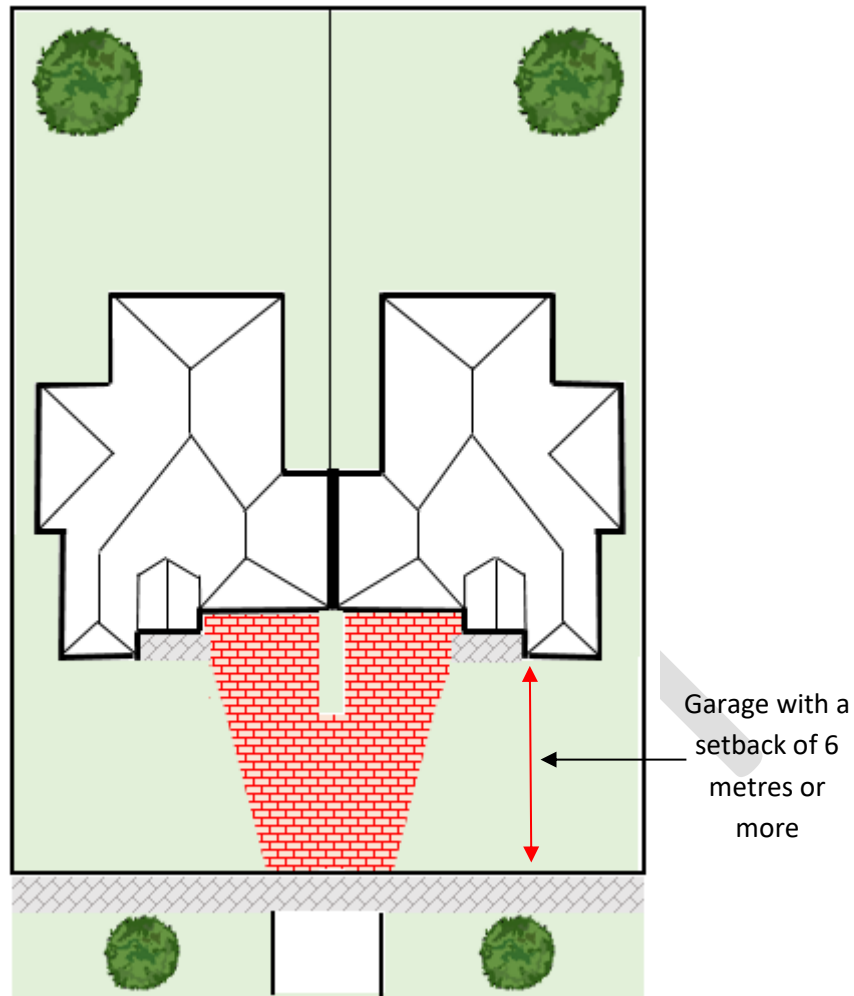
Dwellings in a Side by Side Arrangement with lot frontage less than 20 metres
